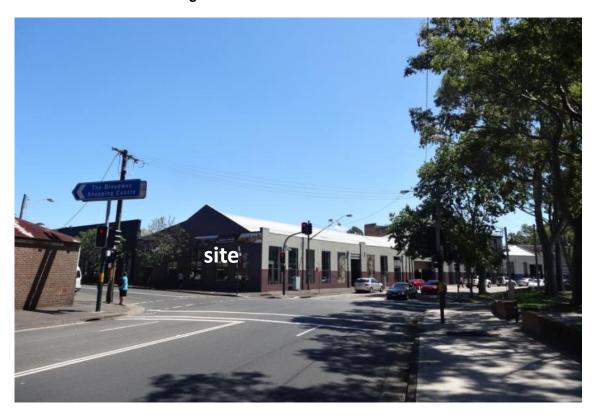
North-east corner of the site viewed from Wentworth Park Road looking across the intersection with Bay Street.
